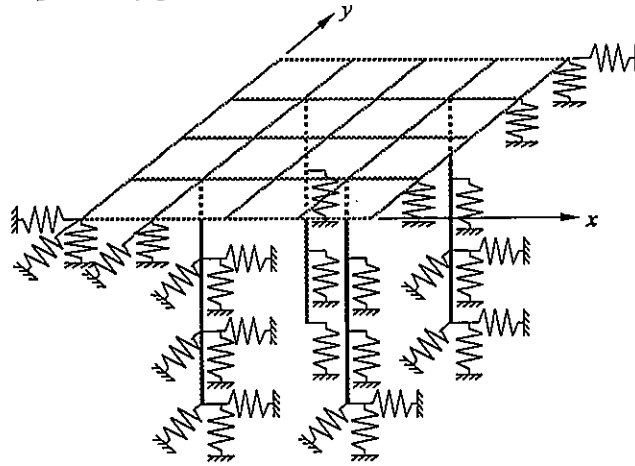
Plate-beam-spring modelling of a piled raft foundation.
